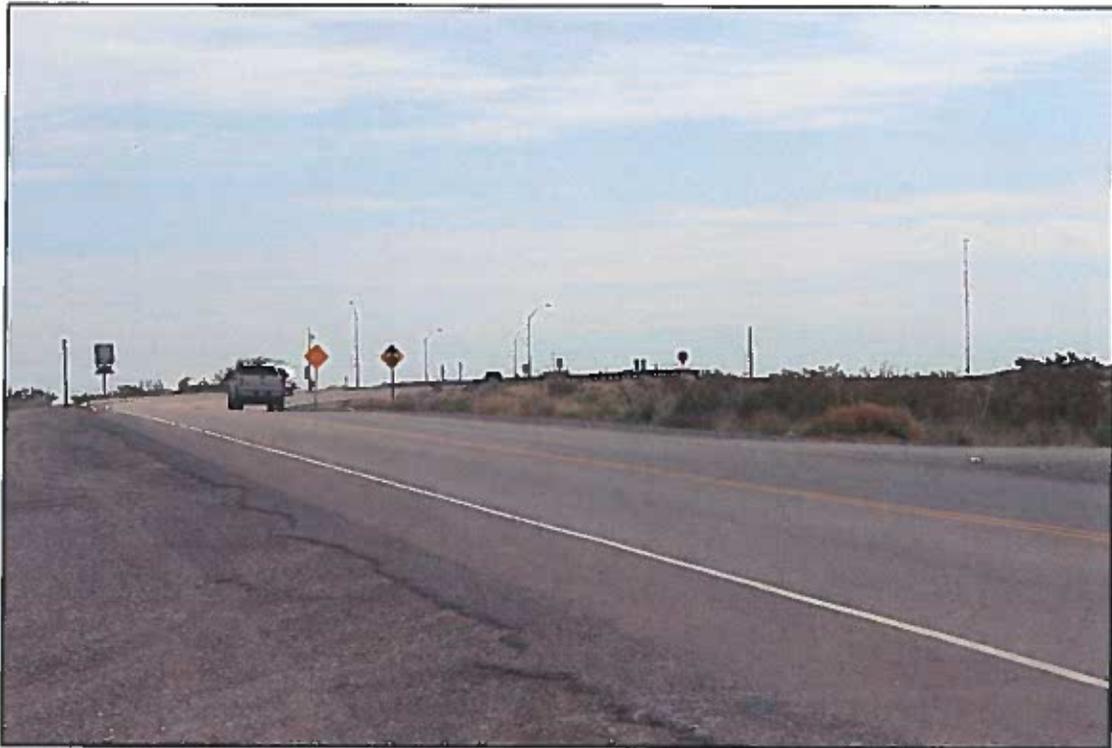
Existing FM 1110, view facing east toward overpass over I-10.
